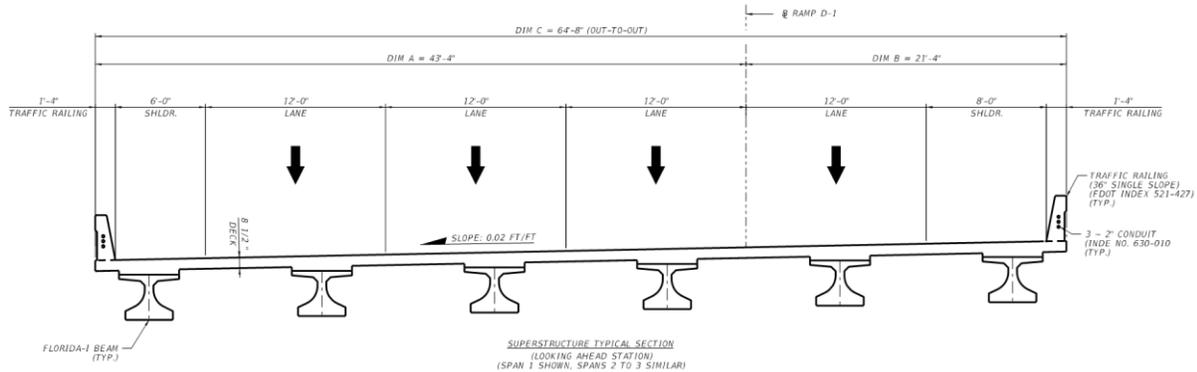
Bridge Typical Section (Bridge No. 13) 1 of 2
